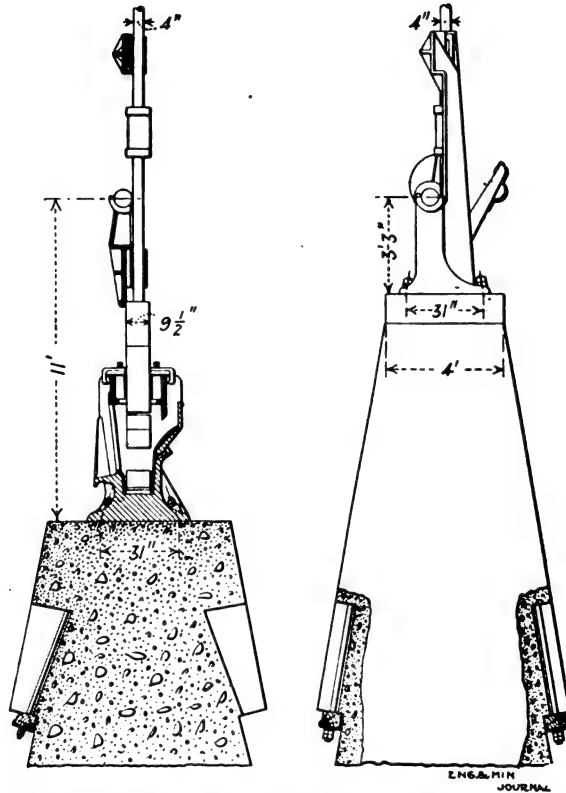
CROSS-SECTION OF BATTERY FOUNDATIONS.
